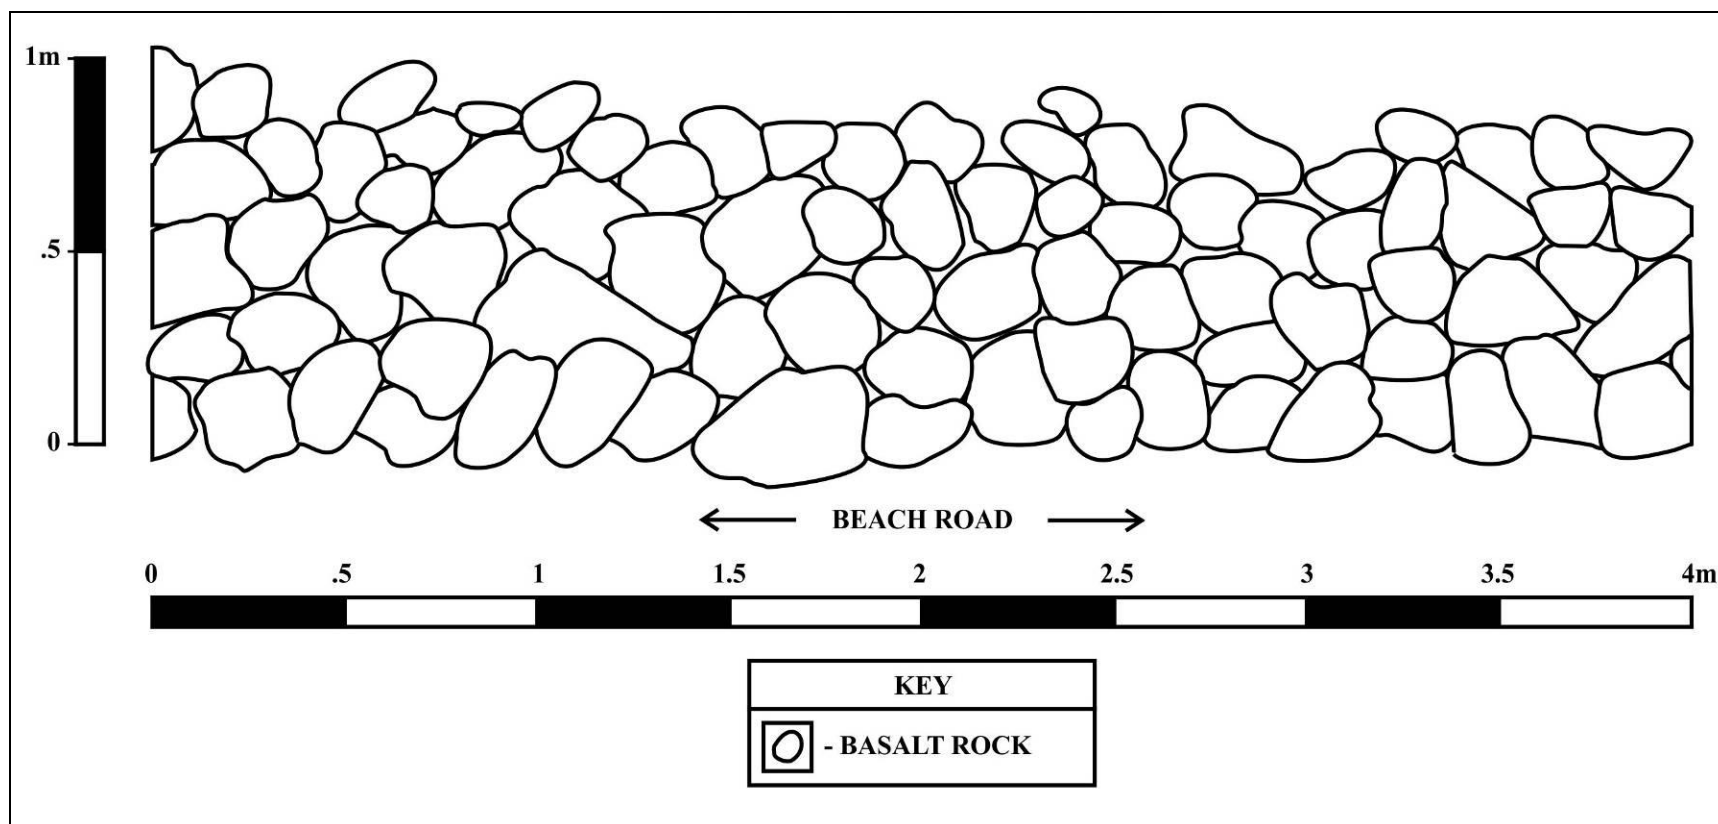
Site 31111 Southwest Rock Wall Profile Showing Typical Wall Construction.
